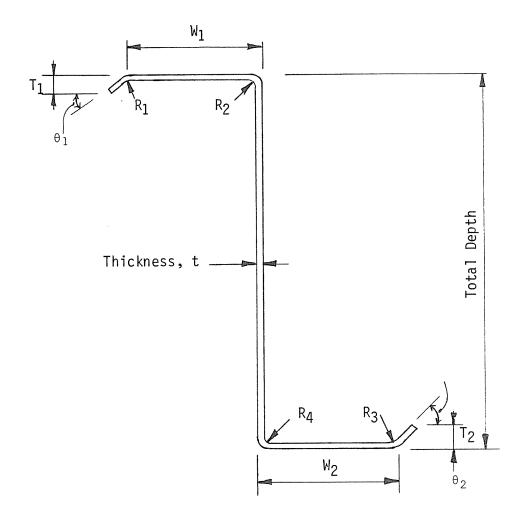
Purlin Cross-Section and Geometric Parameter
